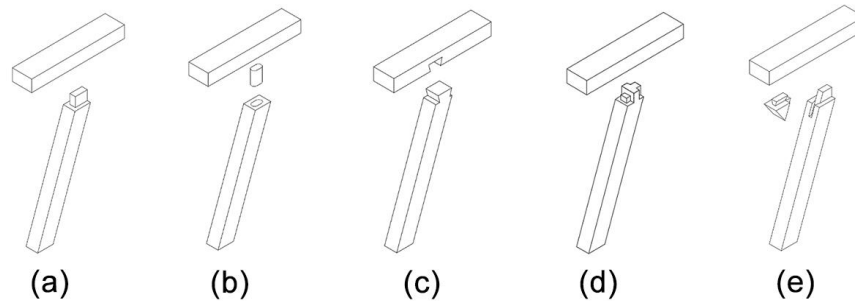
Cantilevered joints: (a) rectangle tenon; (b) split oval tenon; (c) dovetail tenon; (d) cross-stepped tenon; and (e) rear plug corner tenon
